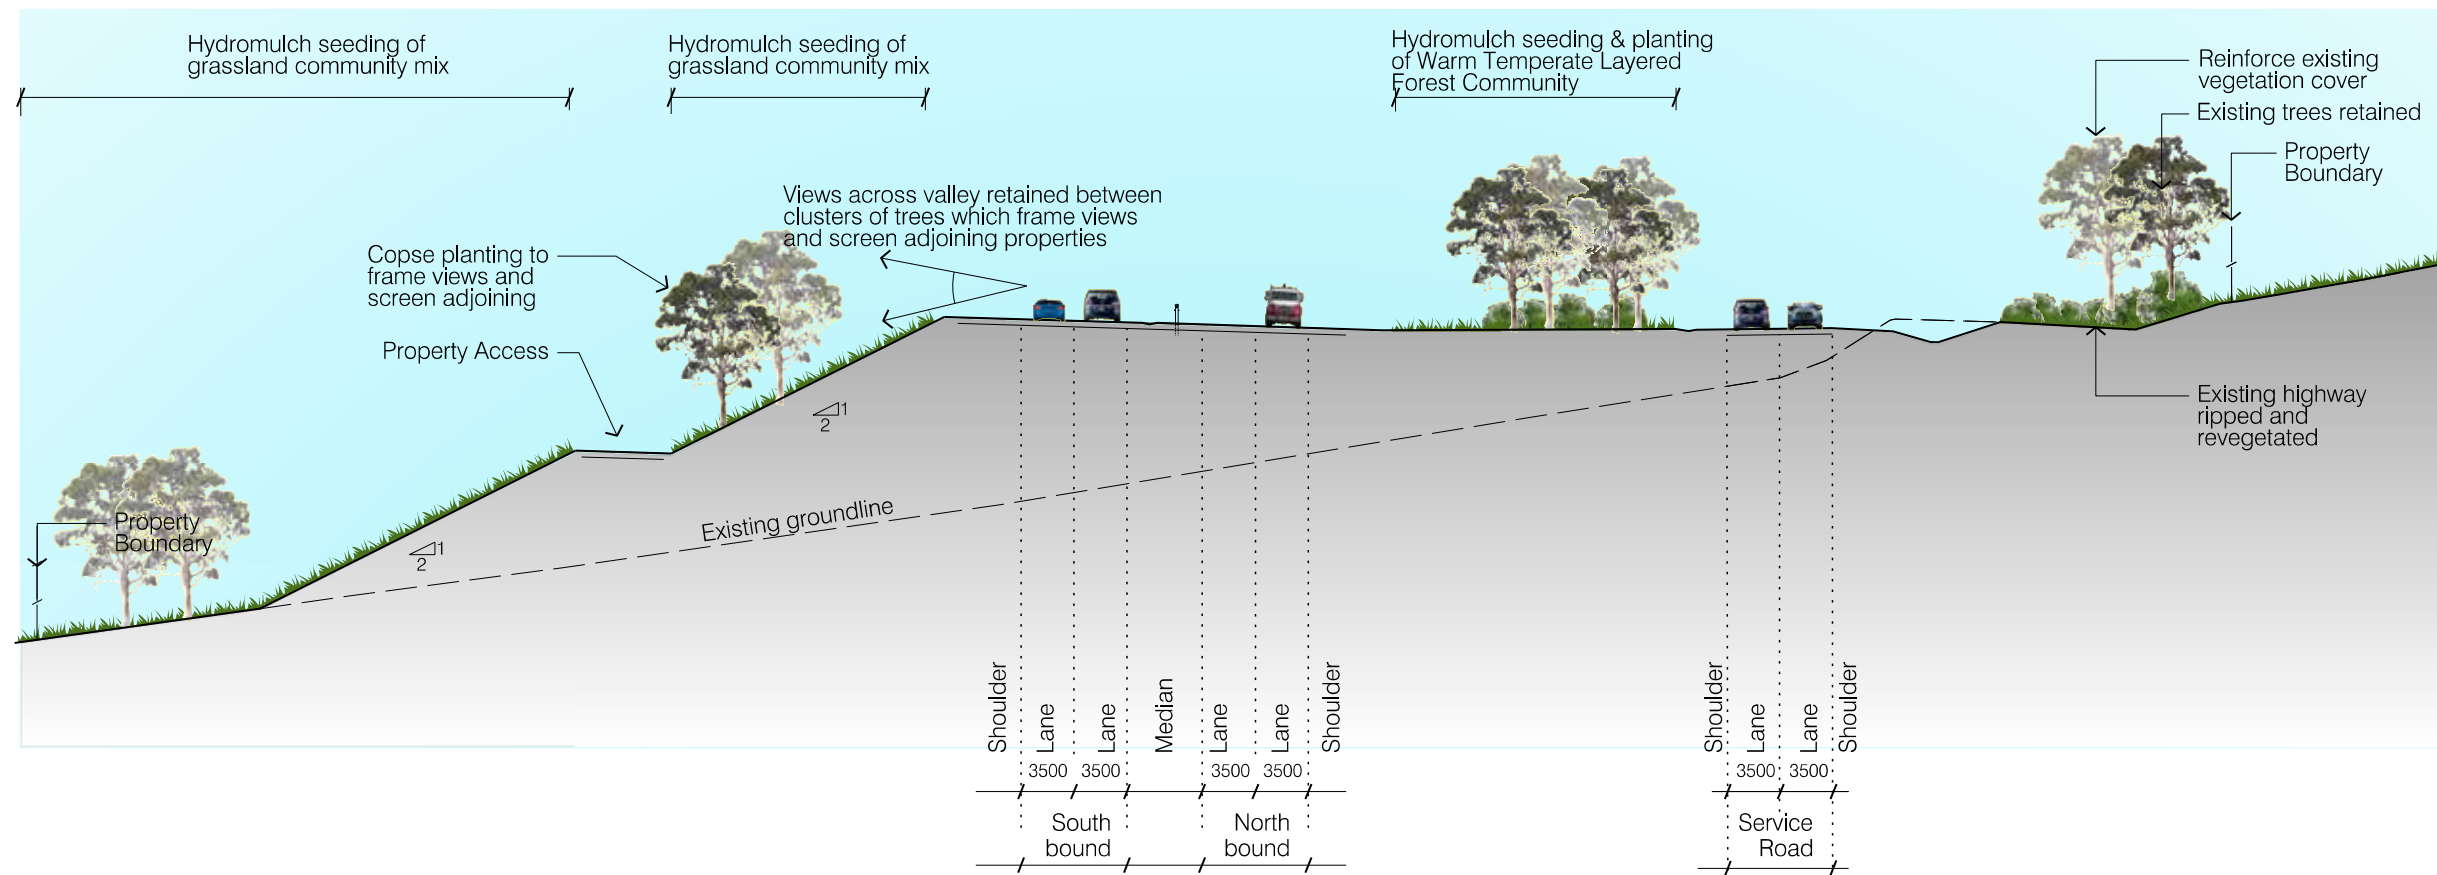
Road cross section at Ch. 11750 (Scale 1:500 @ A3)
